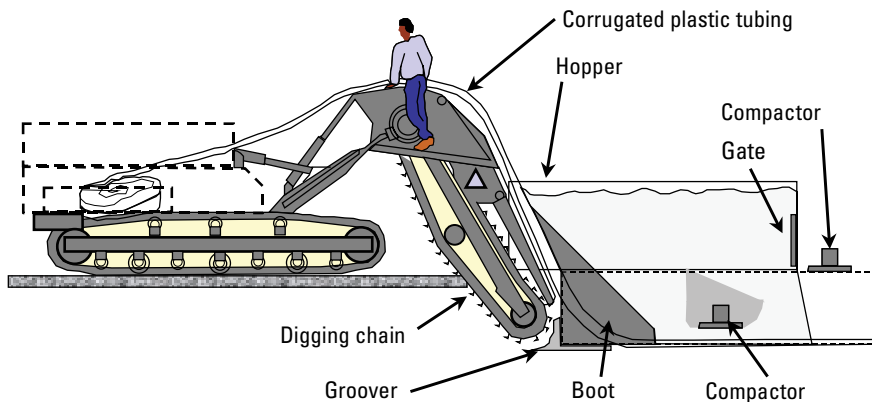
Schematic of automated equipment for installing pipe edgedrains (NHI 1999)
